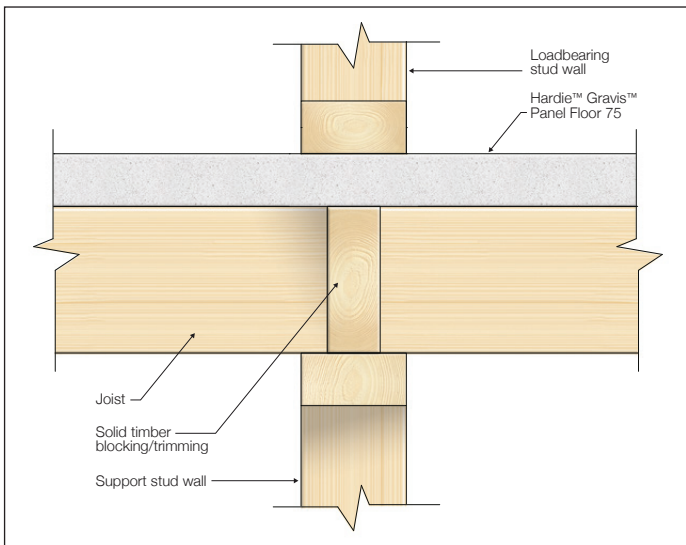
PLATFORM FLOOR WITH INTERNAL LOADBEARING WALL
